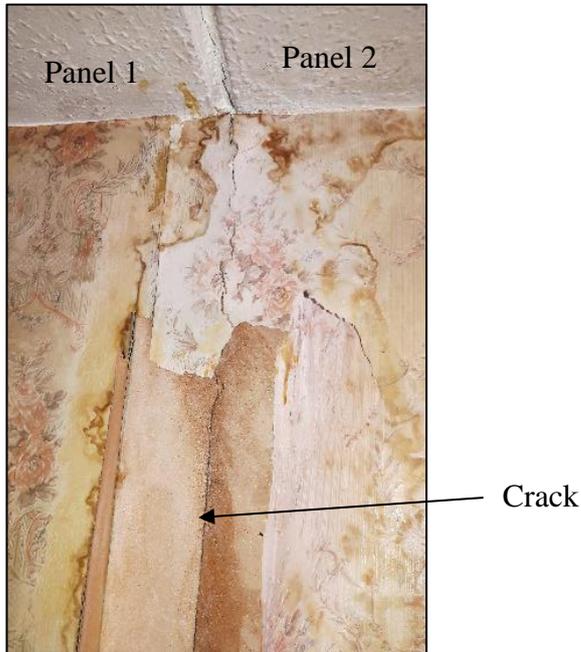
Cracks occur in the internal finishes (plaster/ paint) where two precast concrete panels meet
